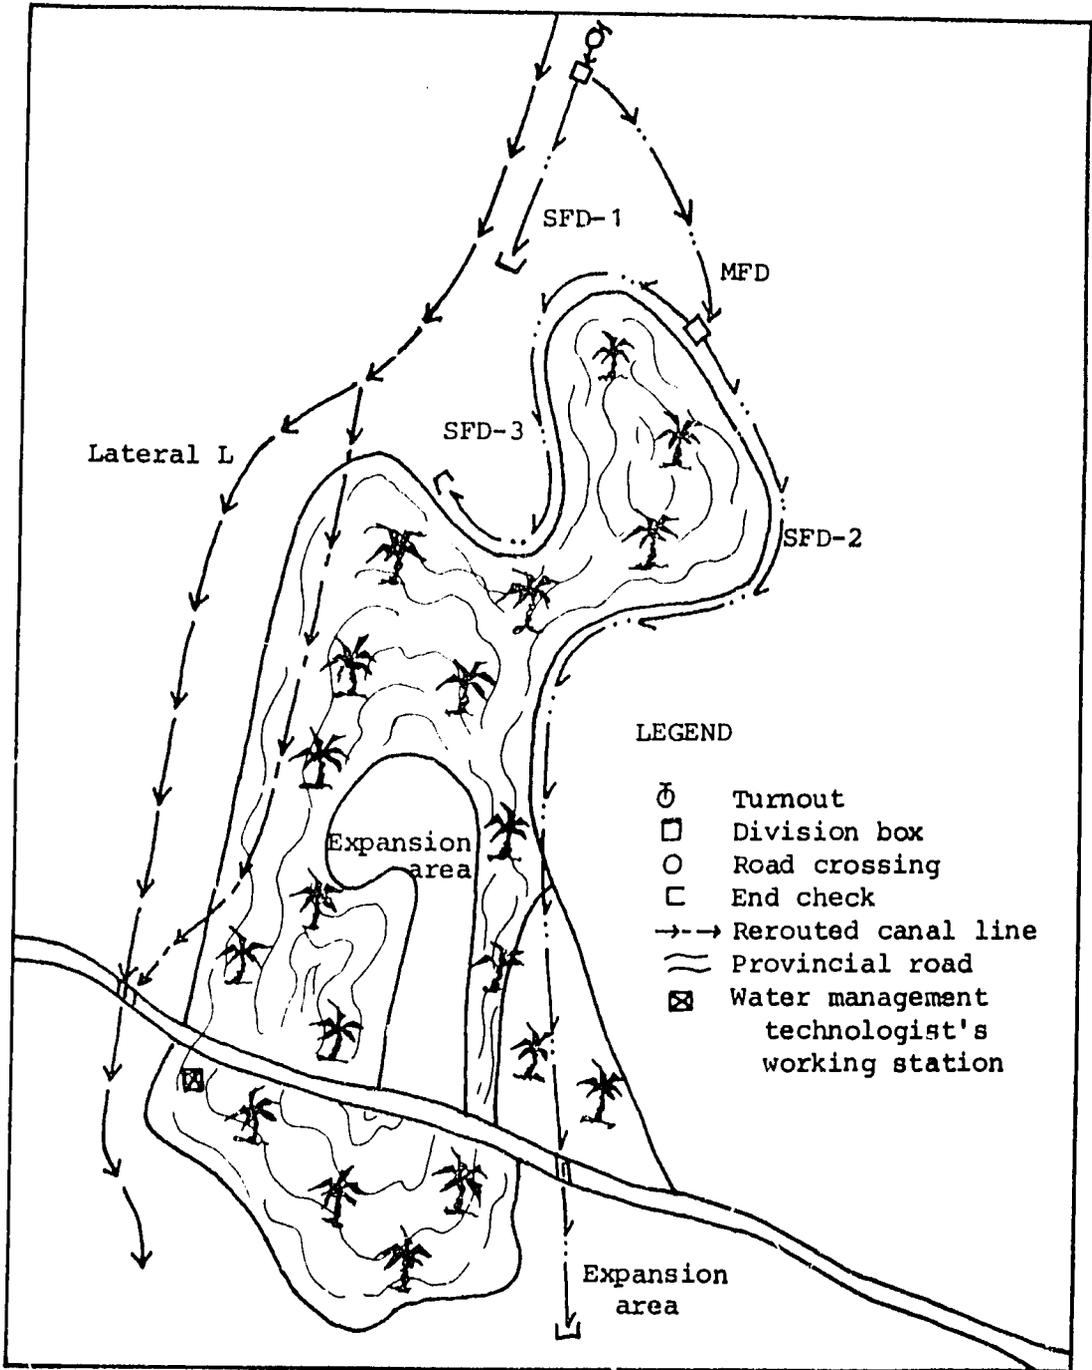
Farmers' proposed location of canal and terminal facilities in RALAT-L-6, Rinconada/Buhi-Lalo project
